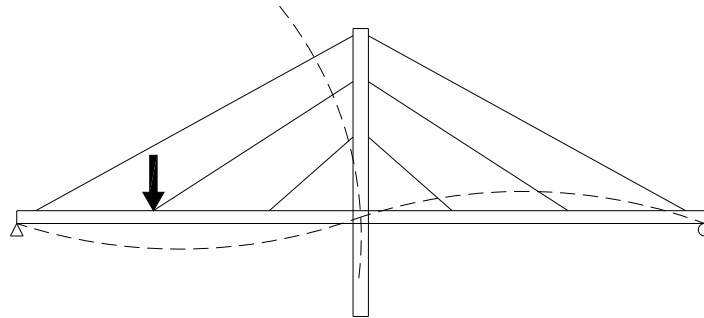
Structural Behaviour of one-pylon cable stayed bridge
